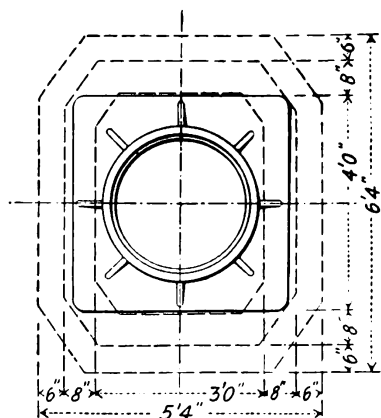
A 5 ft. × 7 ft. concrete manhole.
